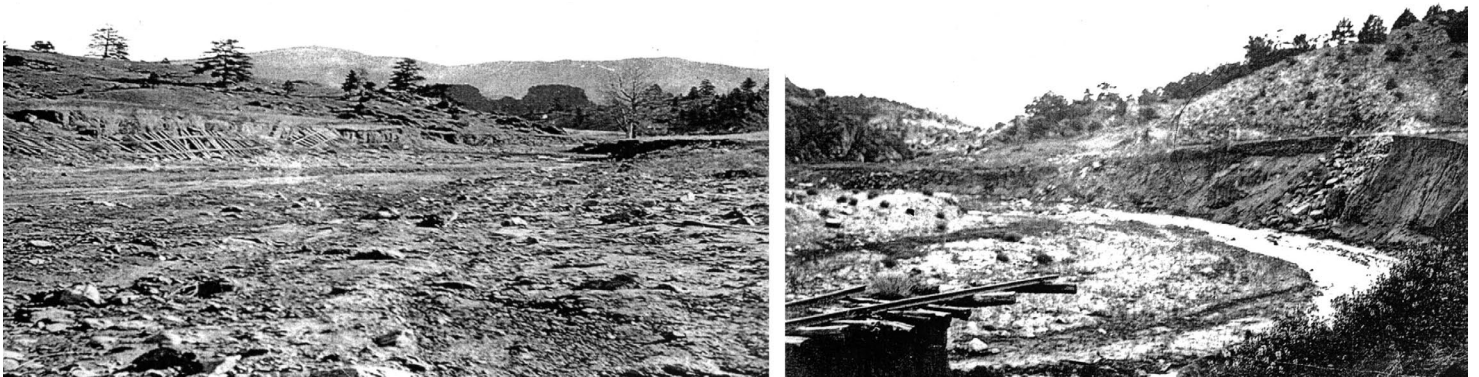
Erosion and railroad damage in Trout Creek (U.S. Forest Service#160469, #156337, 1921).
